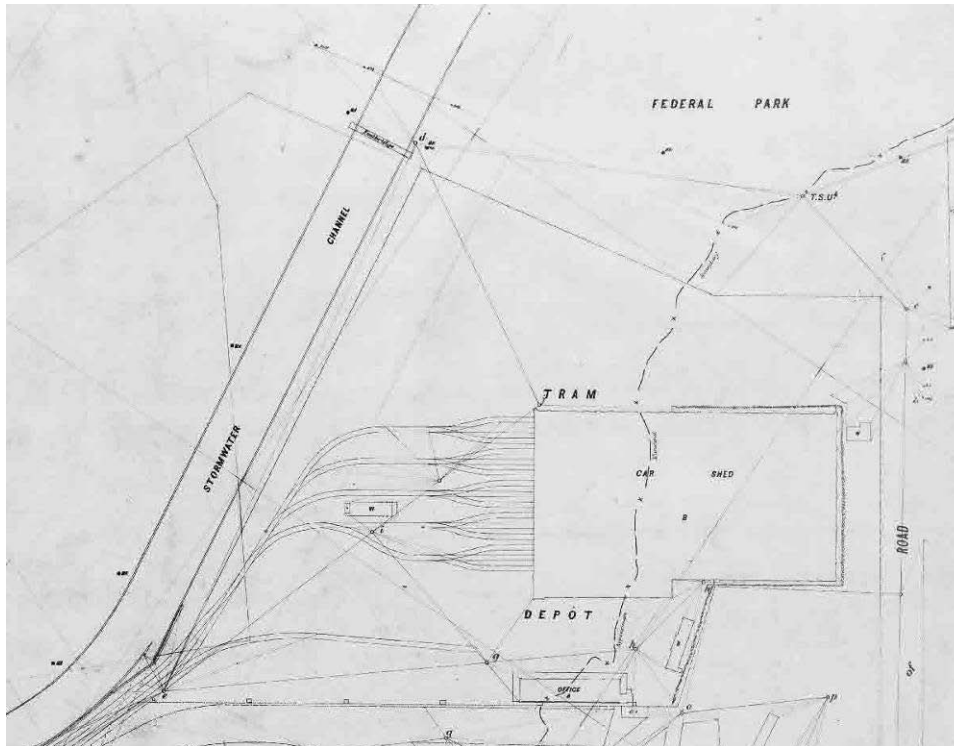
1904 Metropolitan Detail Series Glebe Sheet No. 30. Sydney Water Detail Sheet 86.
